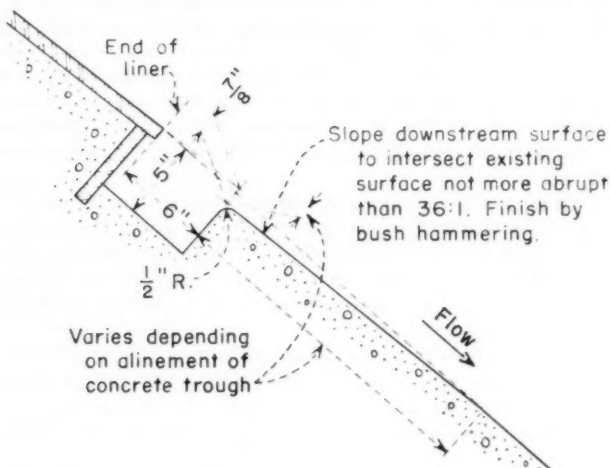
GATE SLOT-TYPE GROOVE AT END OF METAL LINER OF OUTLET CONDUIT
